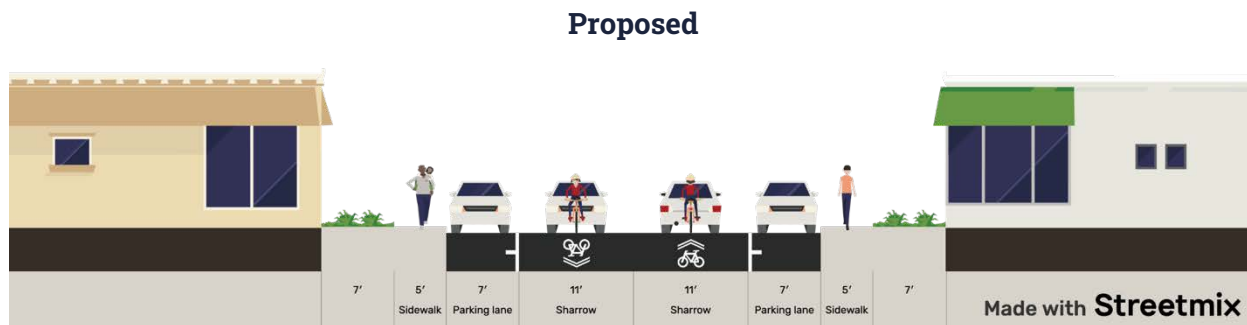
Traffic volumes are low on Cloverdale Drive, meaning that with proper signage and enforcement, the street can become a sharrow: a shared space for bikes and cars. Sidewalks will be continuous along both sides of the street. Diagram created in Streetmix by EC, 2022.
